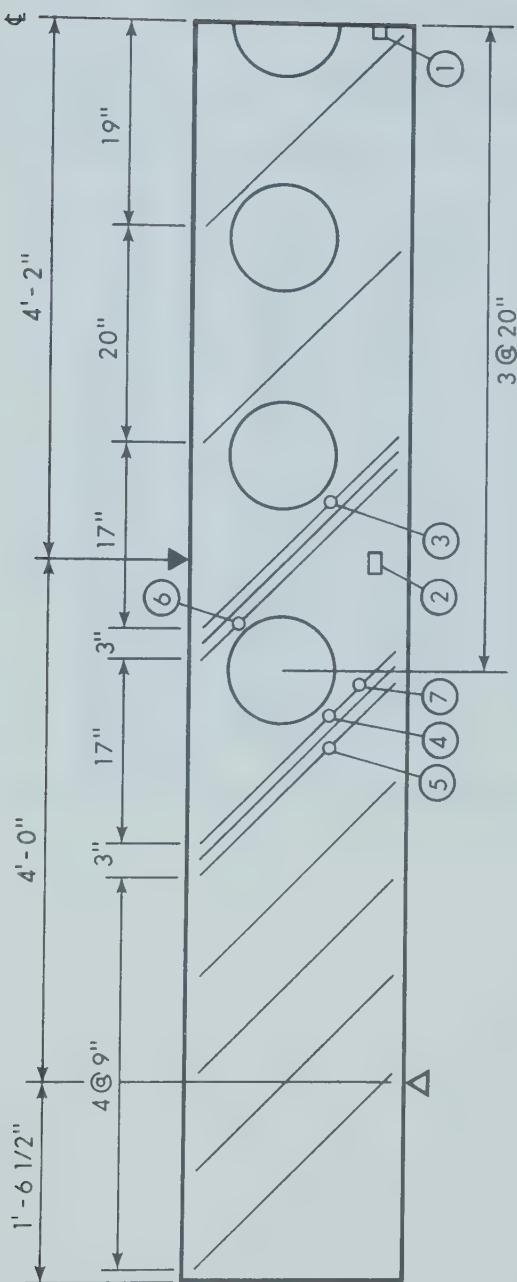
BEAM AD-9 REINFORCEMENT AND GAUGE DETAILS
